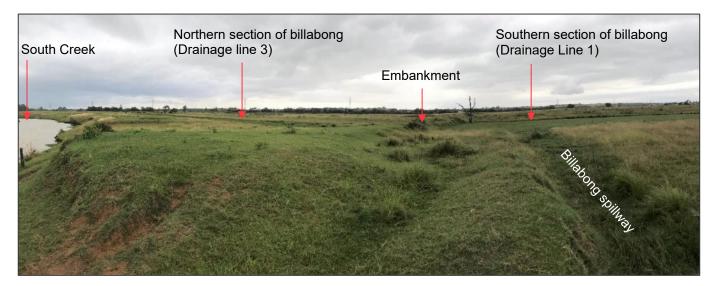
Drainage lines 1 and 3 with dividing embankment (Photo taken looking NW)
